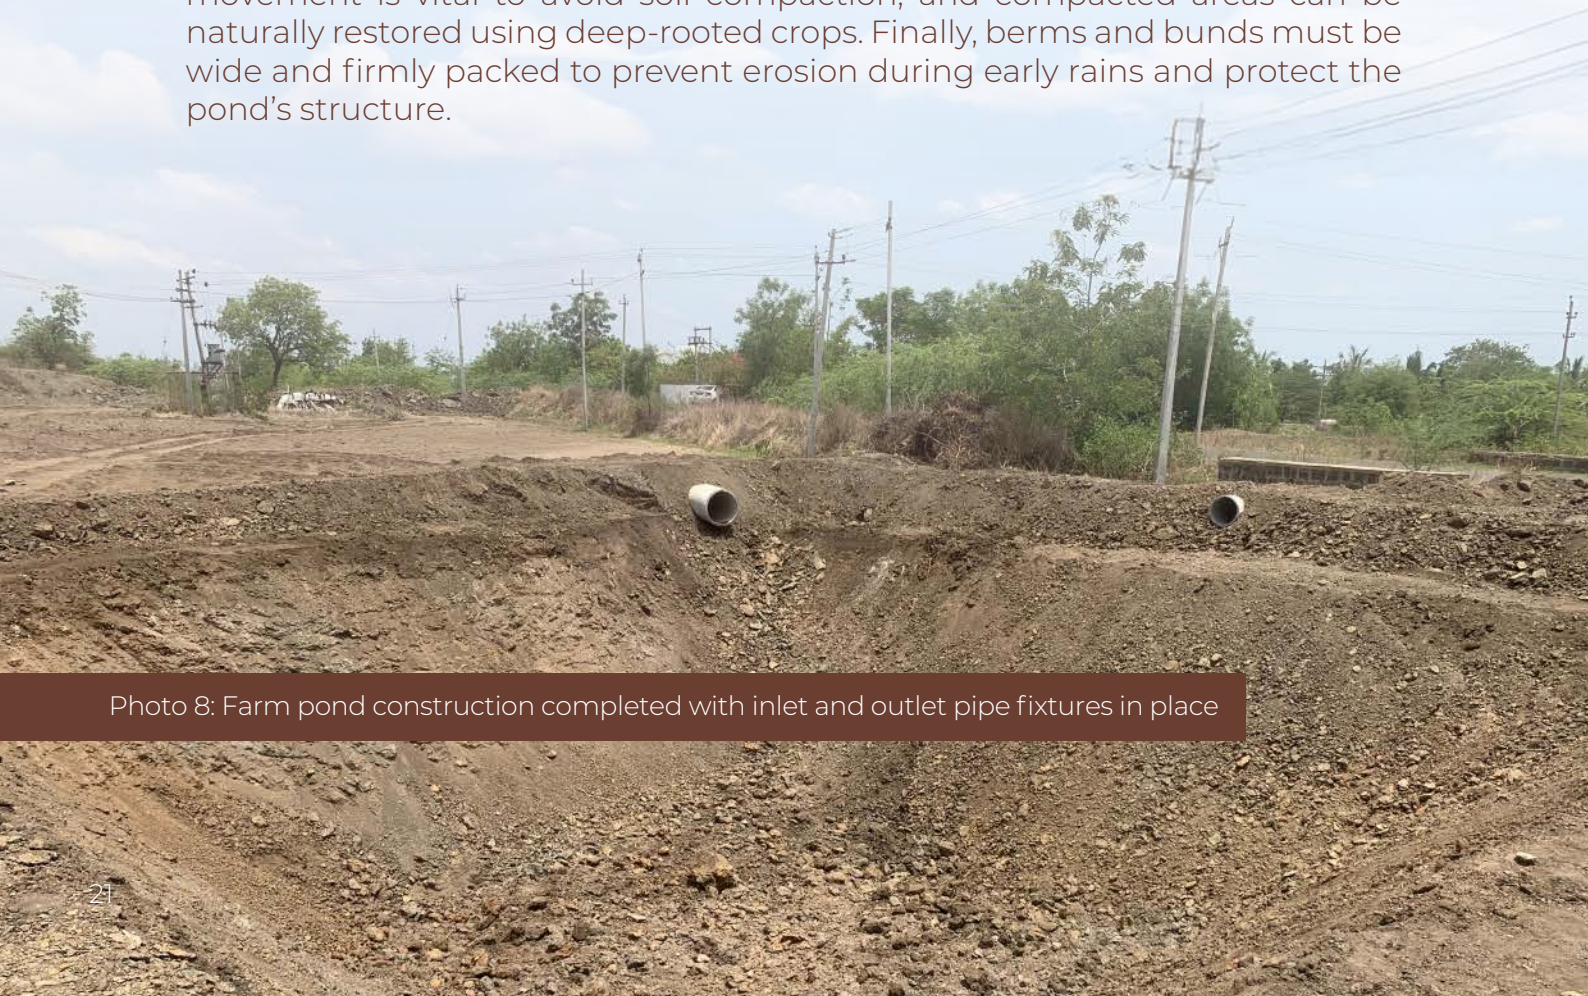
Farm pond construction completed with inlet and outlet pipe fixtures in place
